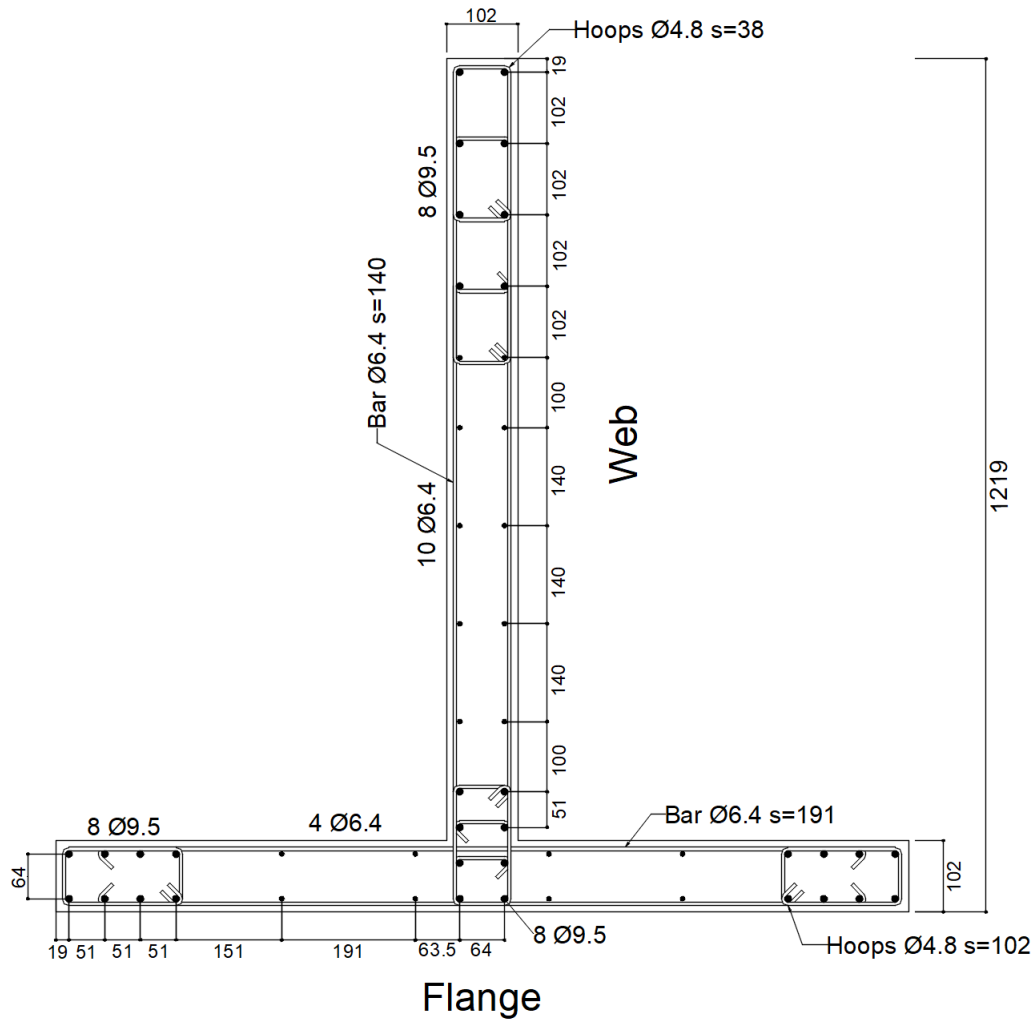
TW2: Cross section and reinforcement detailing [Unit: mm].
